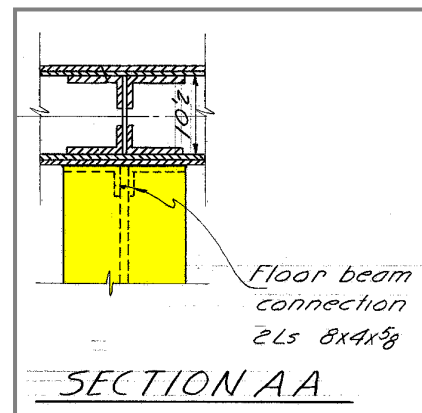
Section looking down upon gusset and floorbeam connection (floorbeam highlighted yellow)
